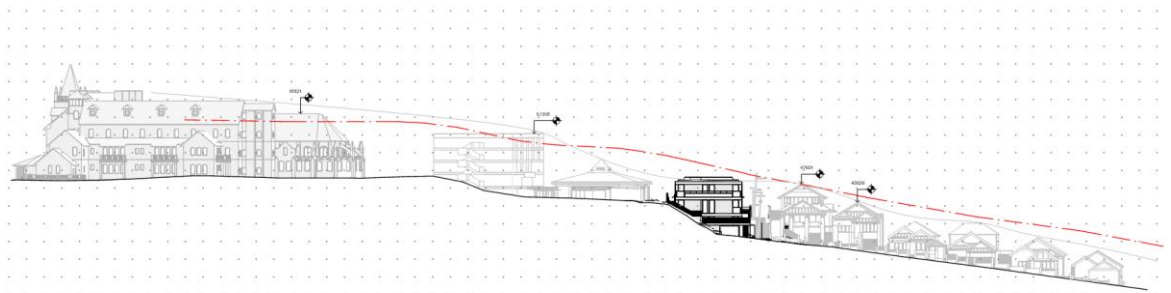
Streetscape elevation and comparison of height with neighbouring dwellings on Inglethorpe Ave.
